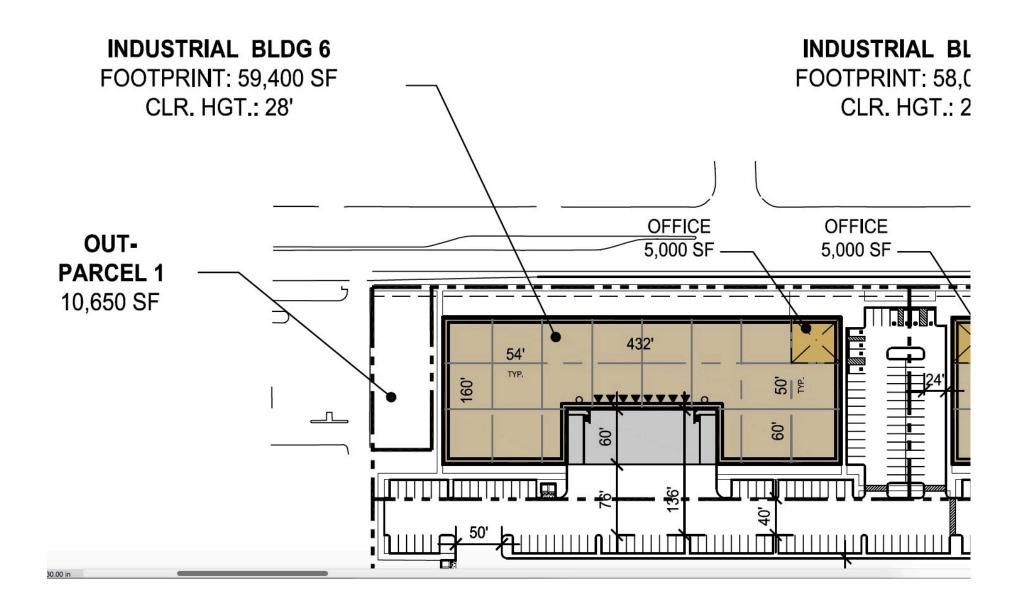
NORTH CROSSROADS BUILDING 6 SITE PLAN
